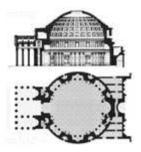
The Pantheon Rome - Floor plan and transversal plan.
